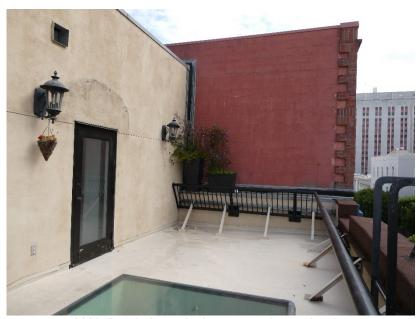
View of fifth floor balcony, looking east. (Photo taken by P&T 03/14/2025)
